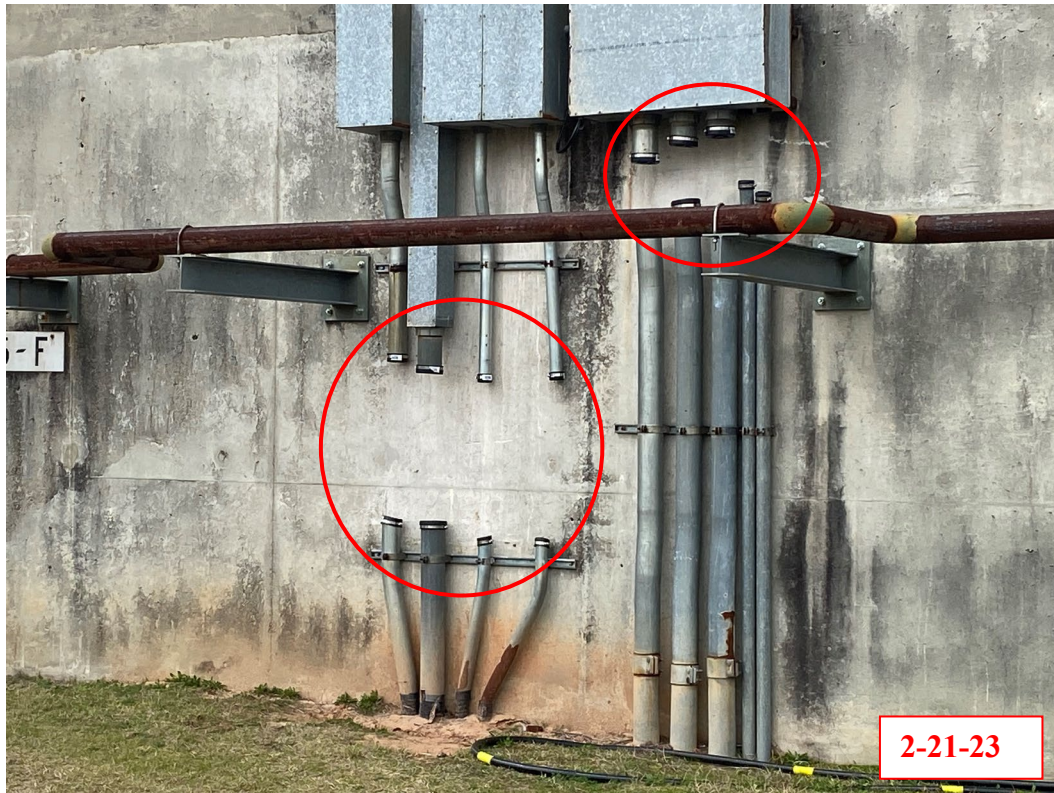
Air-Gapped Security and Communications Conduits, Southwest Corner of 235-F
